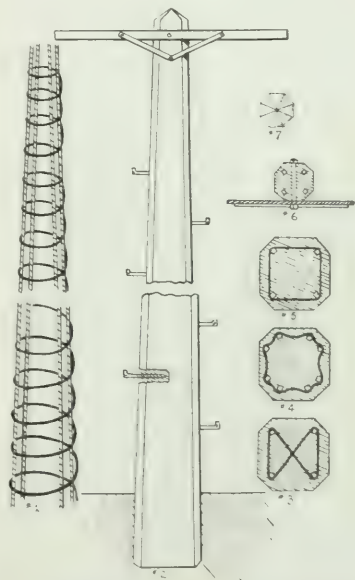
DETAILS OF CONCRETE POLE CONSTRUCTION.
